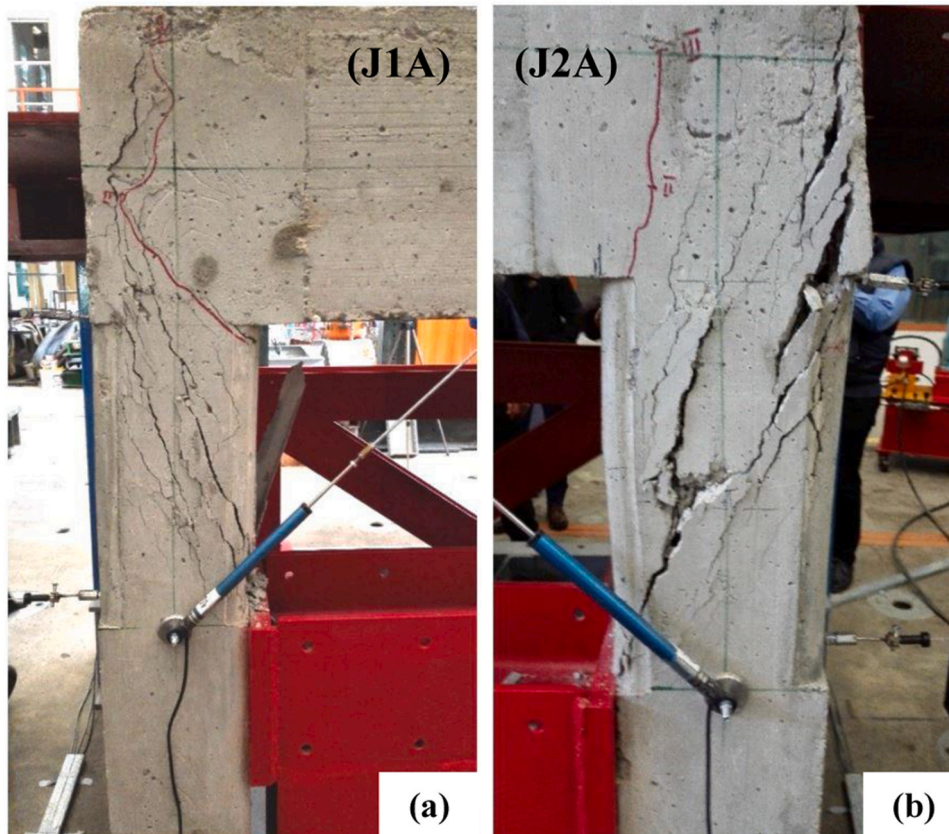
Shear cracks along short columns and damage of joints (a) J1A, and (b) J2A (excessive spalling in column C2A occurred after peak capacity).
